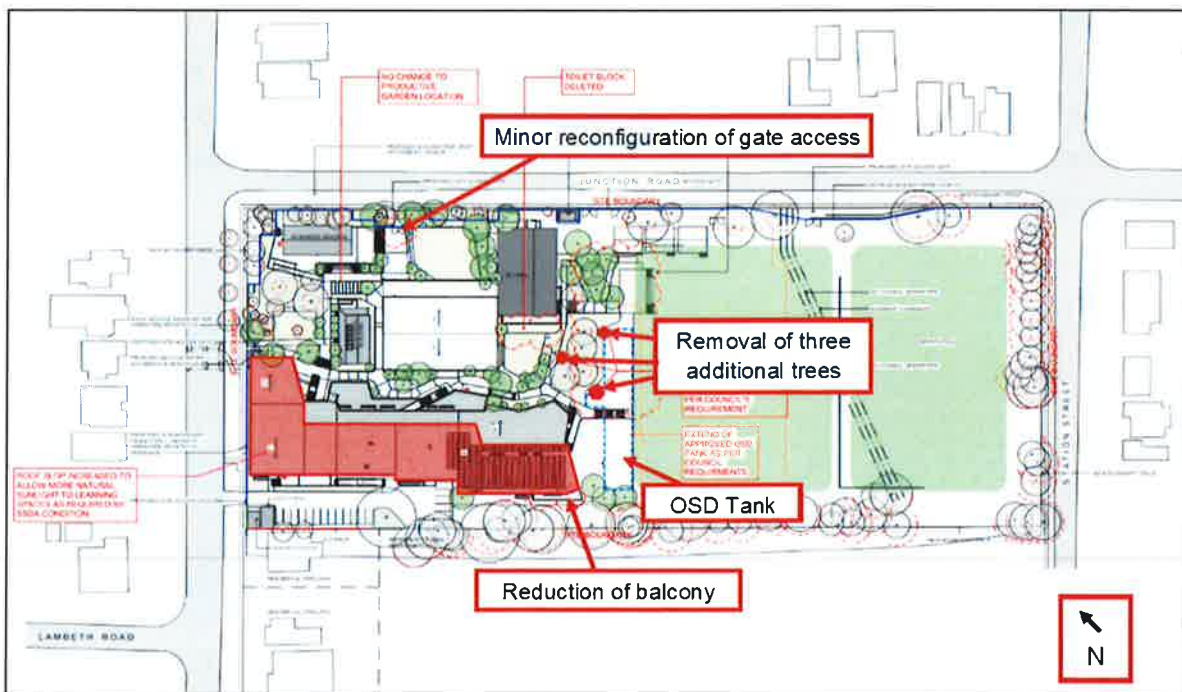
| Proposed Site Plan (Base source: Applicant's Modification Application 2019)
